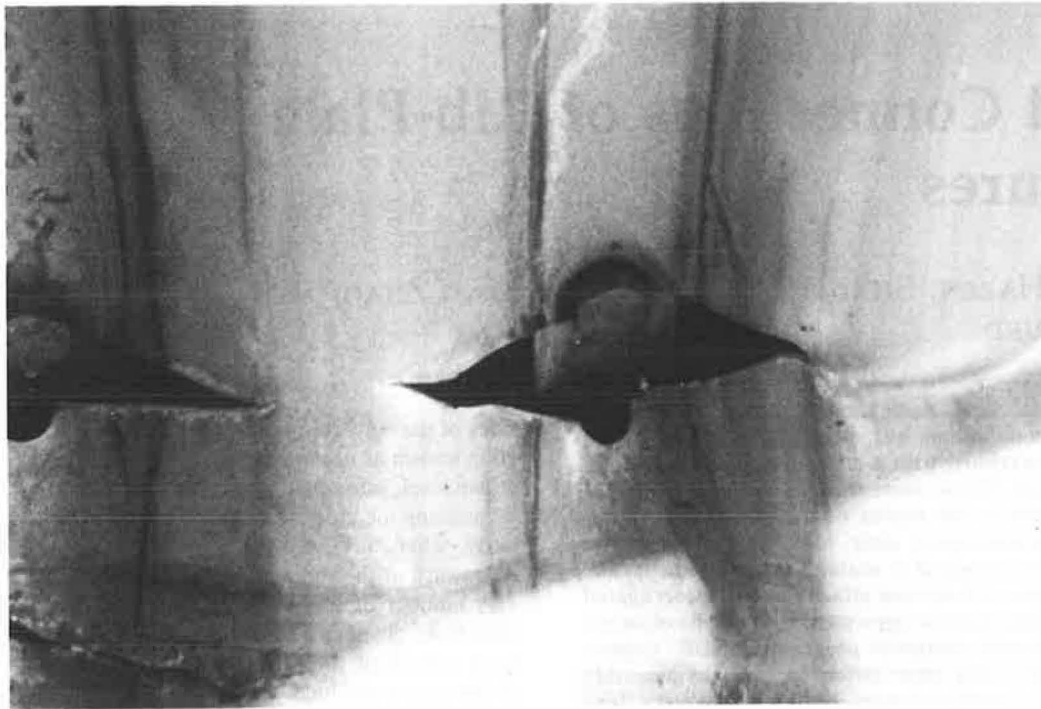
Failed box culvert. (Cross section located at the end of side rib.)
